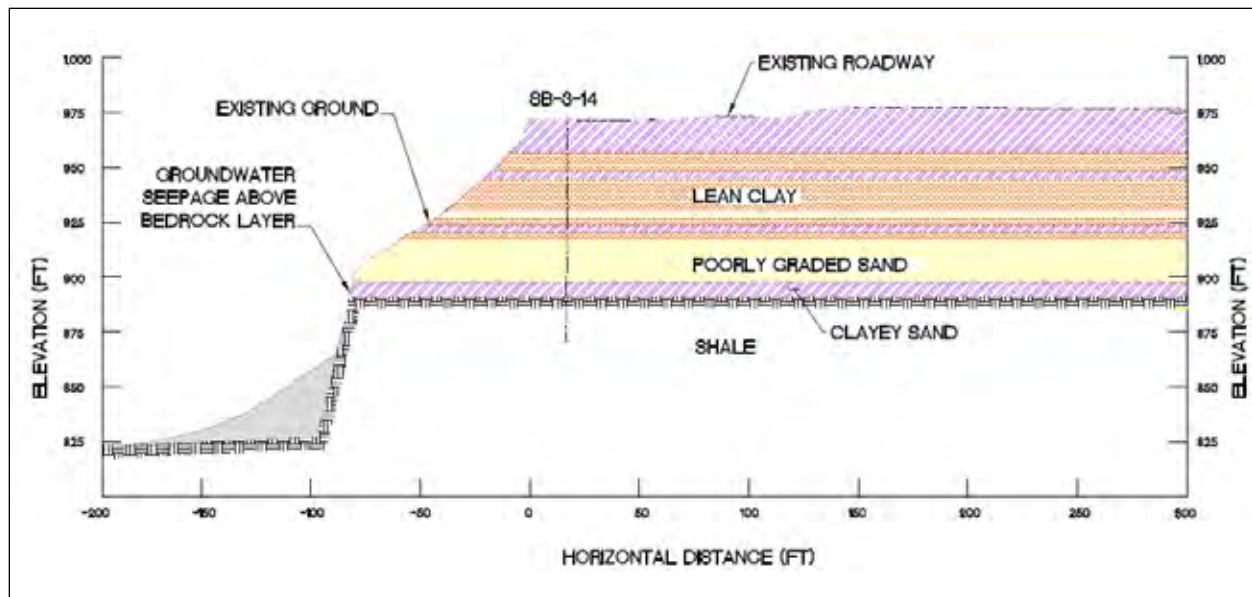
Example modeling cross section showing stratigraphy (Middle Clay Pit cross section in Brickyard Area)
